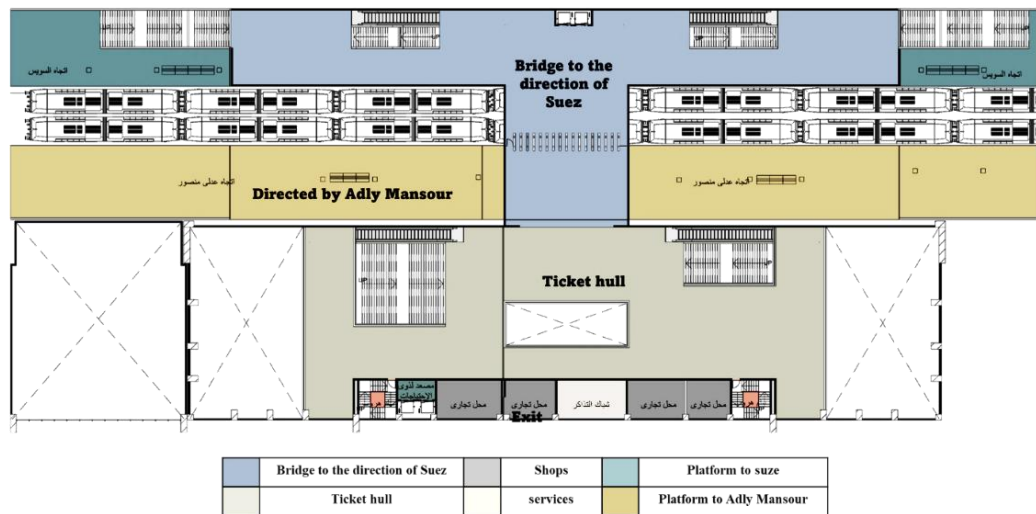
mezzanine floor of train station in Badr station, Source: National Authority for Tunnels.(Tunnels, 2022).
